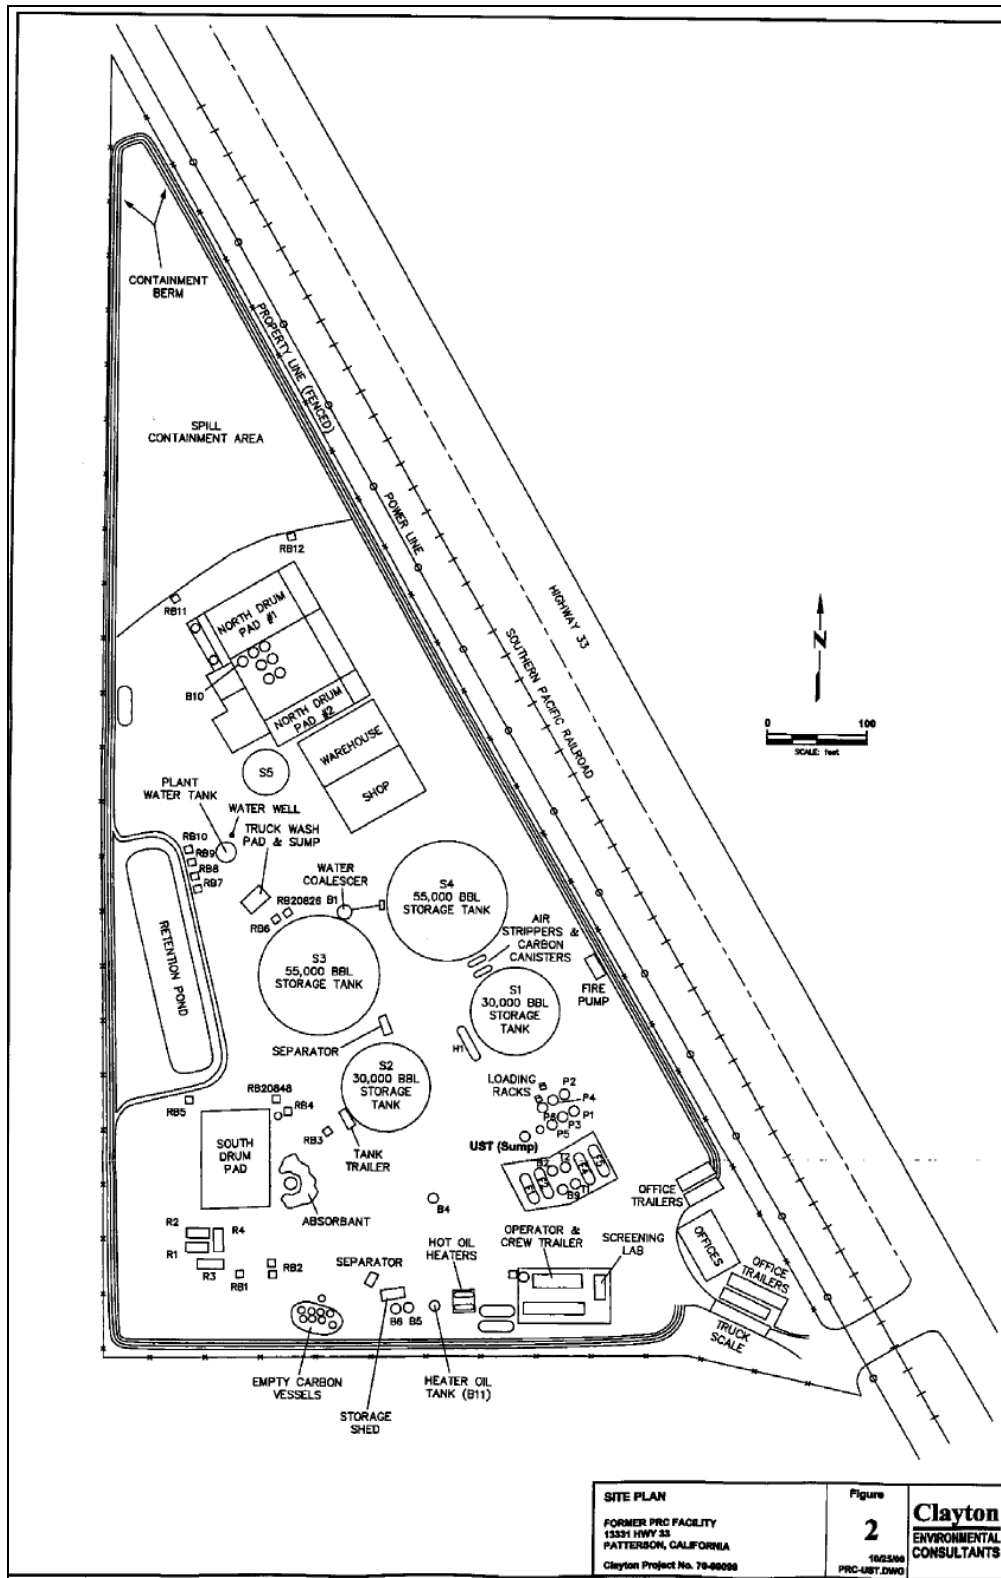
Site Plan of Former PRC Facility (Source: Clayton Group Services)
